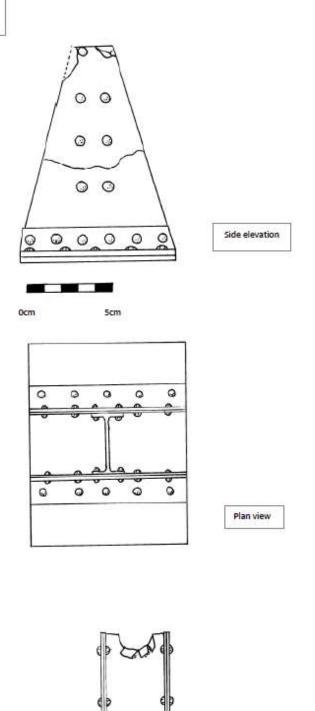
Area 2. Cast iron and rivetted footing to RSJ framework of Ashlin's building No 4 / Block 9
